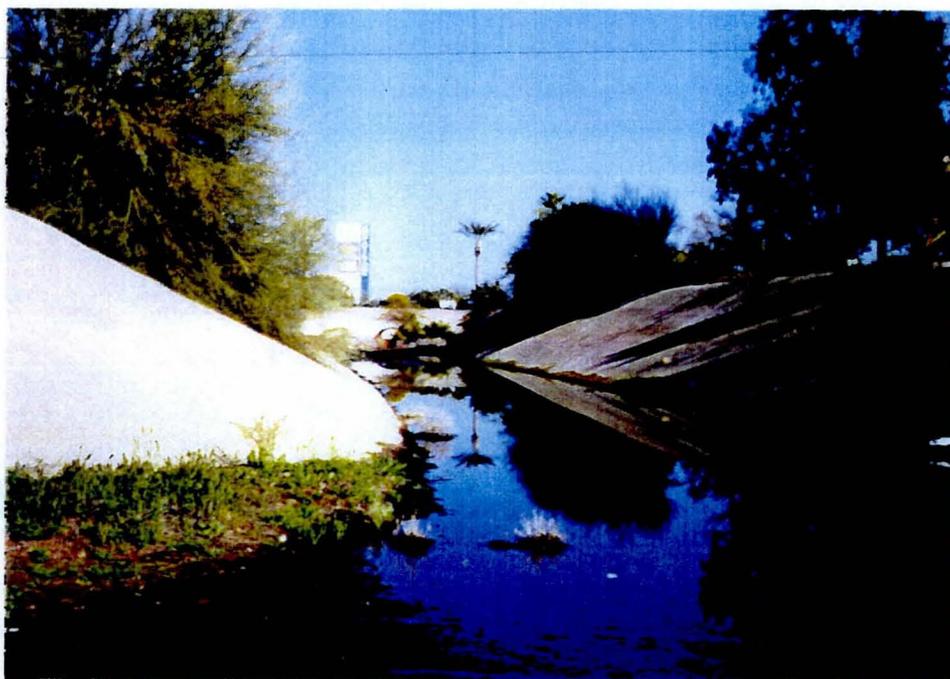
Looking southeast at pooling of water in basin three and drainage features.
